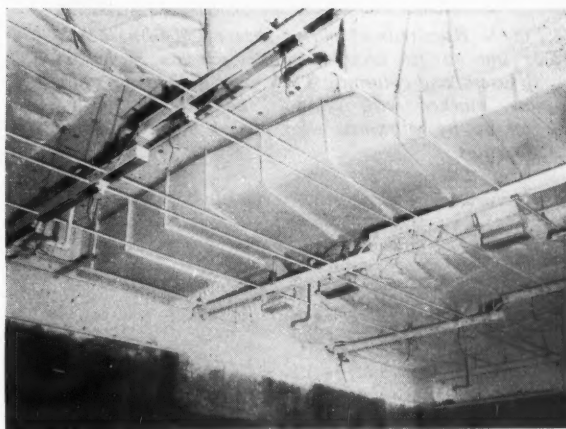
Early stages, showing maze of piping, ducts, channels, all co-ordinated in advance. Sprinkler system pipe, upper centre, passes over and under lighting channel. Ceiling frame work, suspended from lighting channels, will be bolted to metal wall angles for rigidity.
